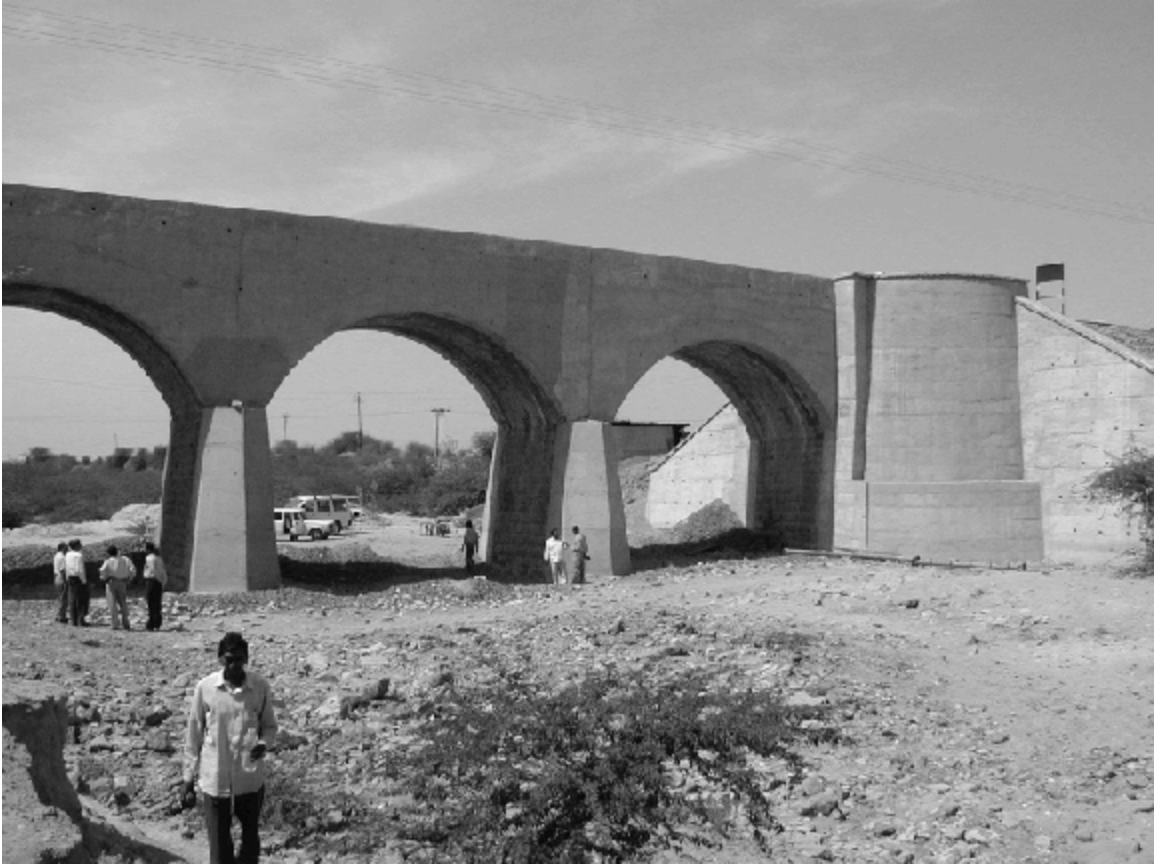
Bridge No. 48 converted from meter gage to broad gage by adding concrete on both sides of stone arches
